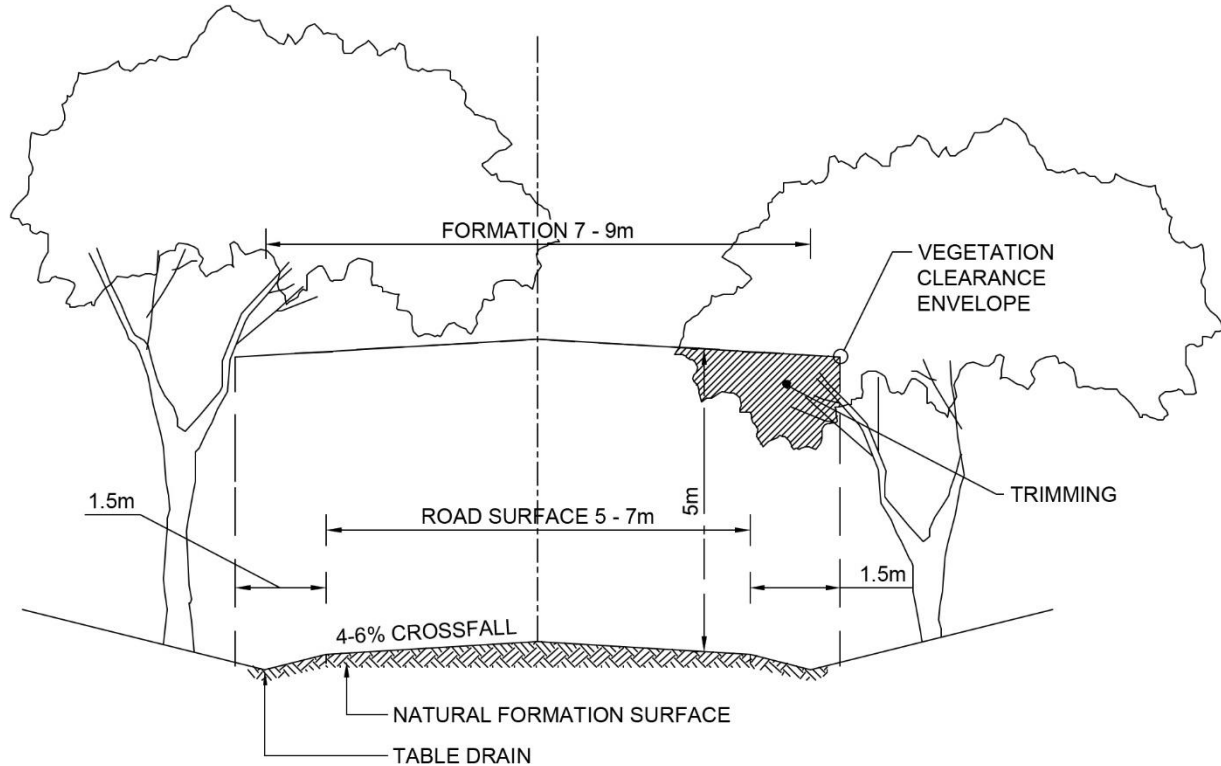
Rural Sheeted Category 6 Construction Cross Section
